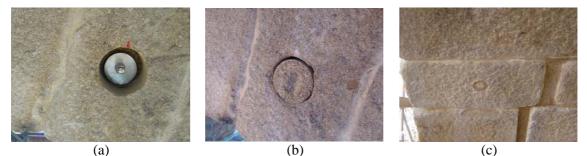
(a) Cylindrical-shaped anchor plate used in the arch anchors; (b) stone slip taken from a drilled core; (c) final visual aspect of a stitching anchor.
